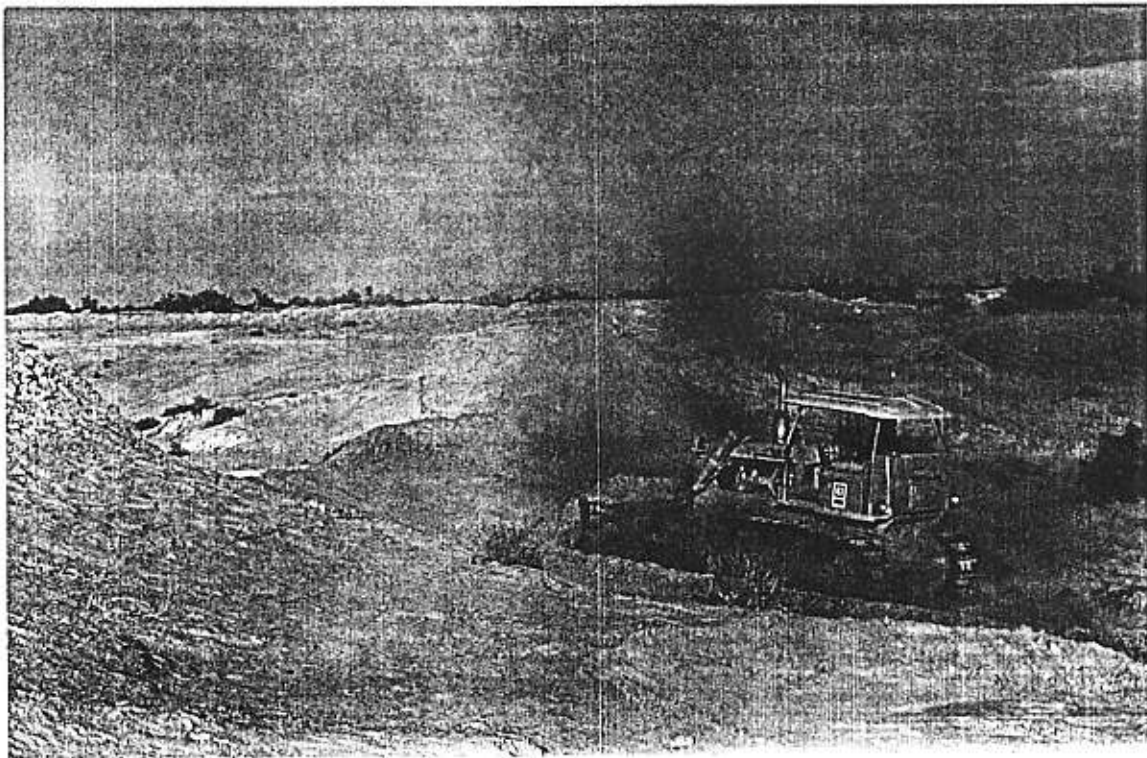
CONSTRUCTION OF FLOOD CHANNEL PROTECTION BUND NEAR MADAGAN VILLAGE
